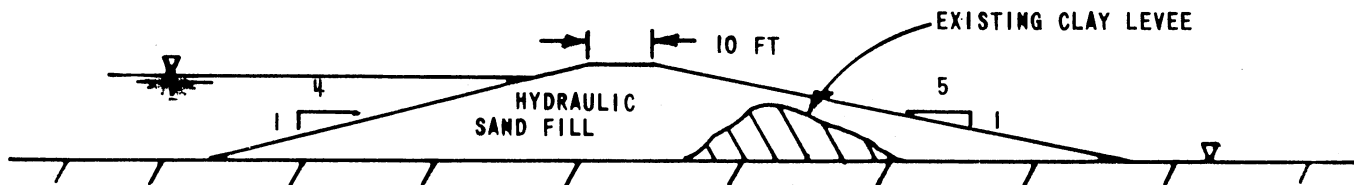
shows typical sections of improved main stem levees. The sand levee section was an empirical design based on the results of a full scale test levee made in the Drury Drainage District (U.S. Army Corps of Engineers, 1962). The test levee indicated that the landside slope would have adequate slope stability and minimal erosion if the levee section had a 1.0 vertical (V) on 4.0 horizontal (H) riverside slope, a 10 foot crown width and a 1.0 V on 5.0 H landside slope. The selected levee section violates a basic criterion for control of seepage through dams and levees. Namely, a toe drainage system is not provided to prevent the free surface of seepage from exiting on the landside slope.
